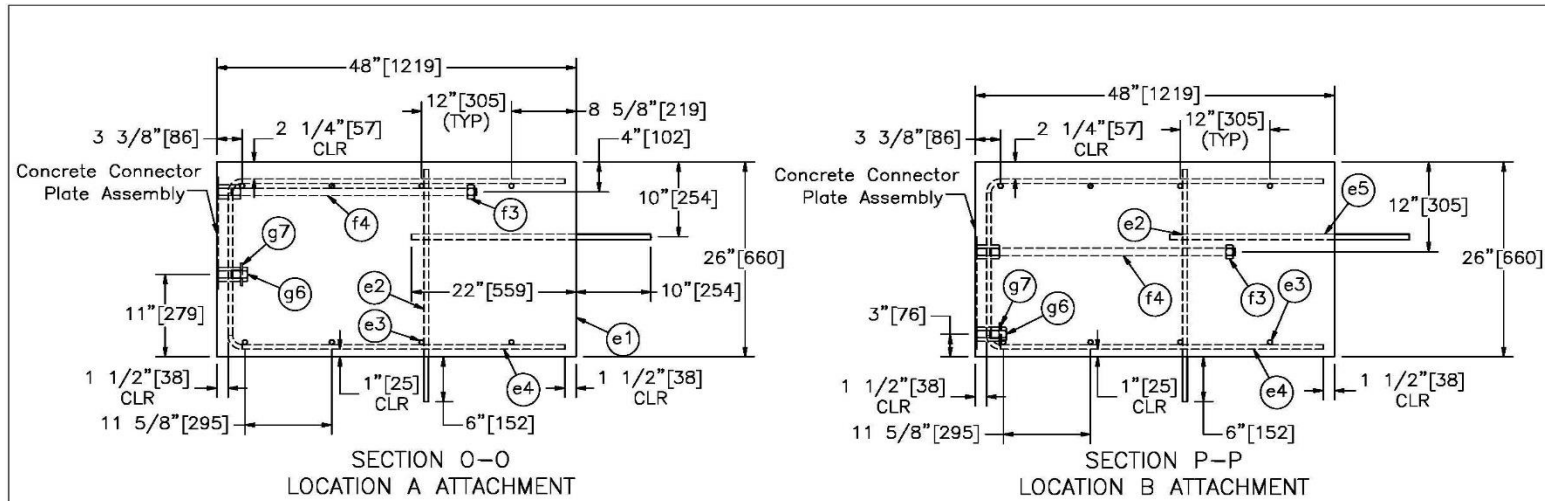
Test Slab Assembly Details, Test No. STBR-4
